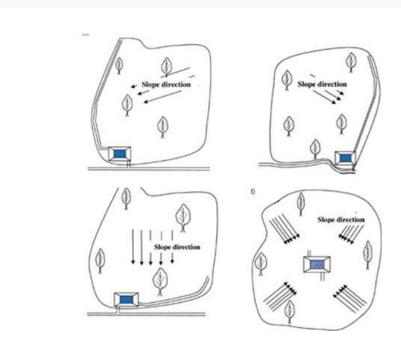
Planning and selection of site for dugout farm pond. (Source: Reddy et al. 2012)
